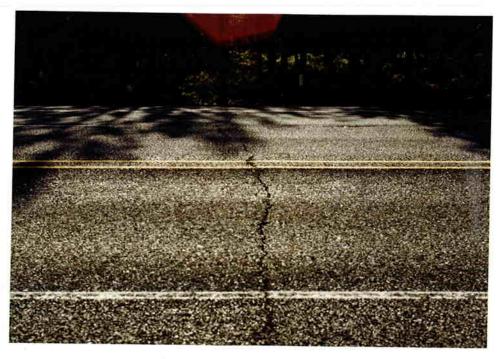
1993 Pavement Condition, Section 1 - Styrelf
